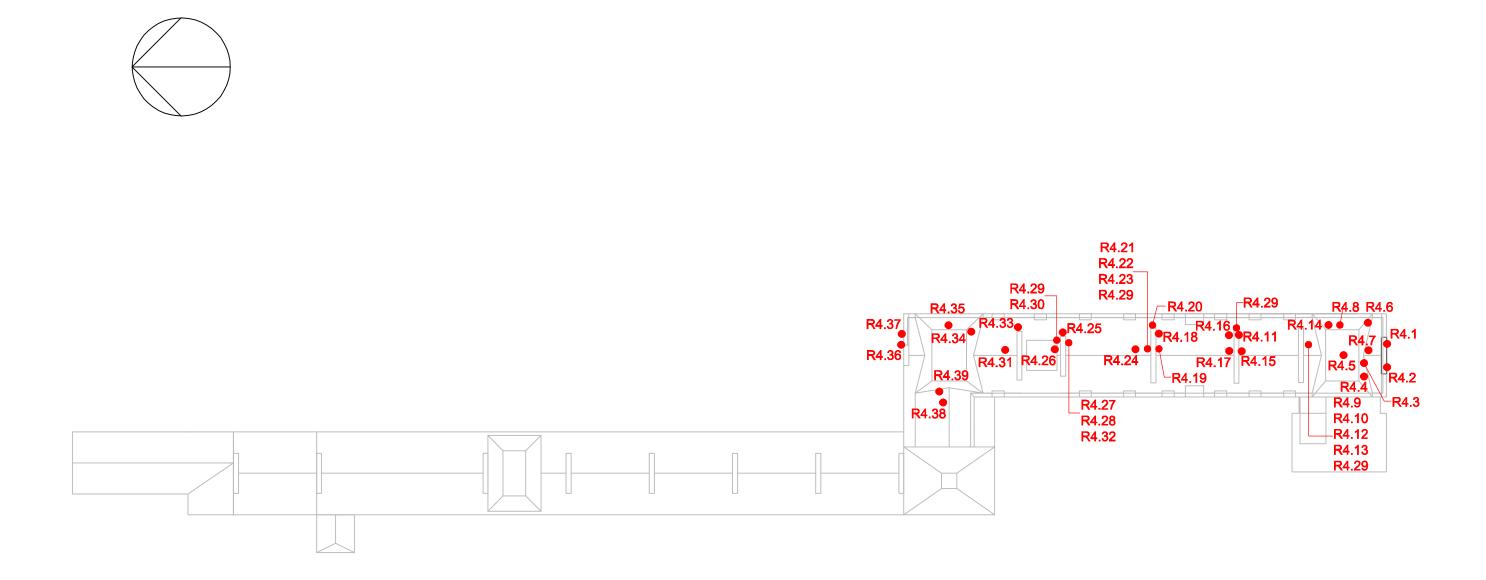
Plan R4 of Station Hotel Building showing Defect/Observation Locations
